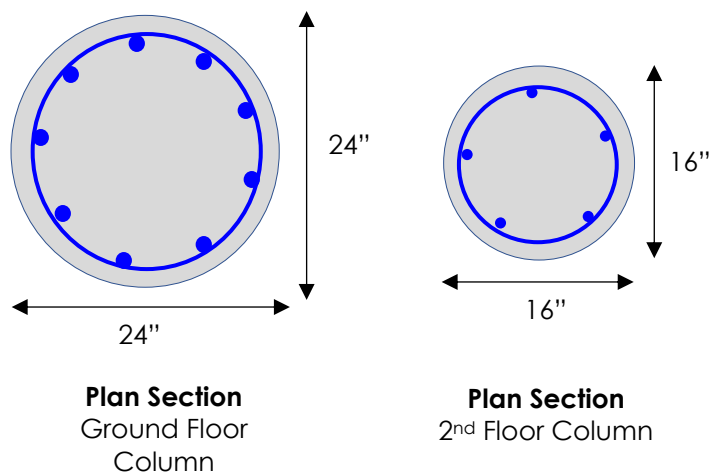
Left: Schematic sections through Ground and 2nd Floor Columns
